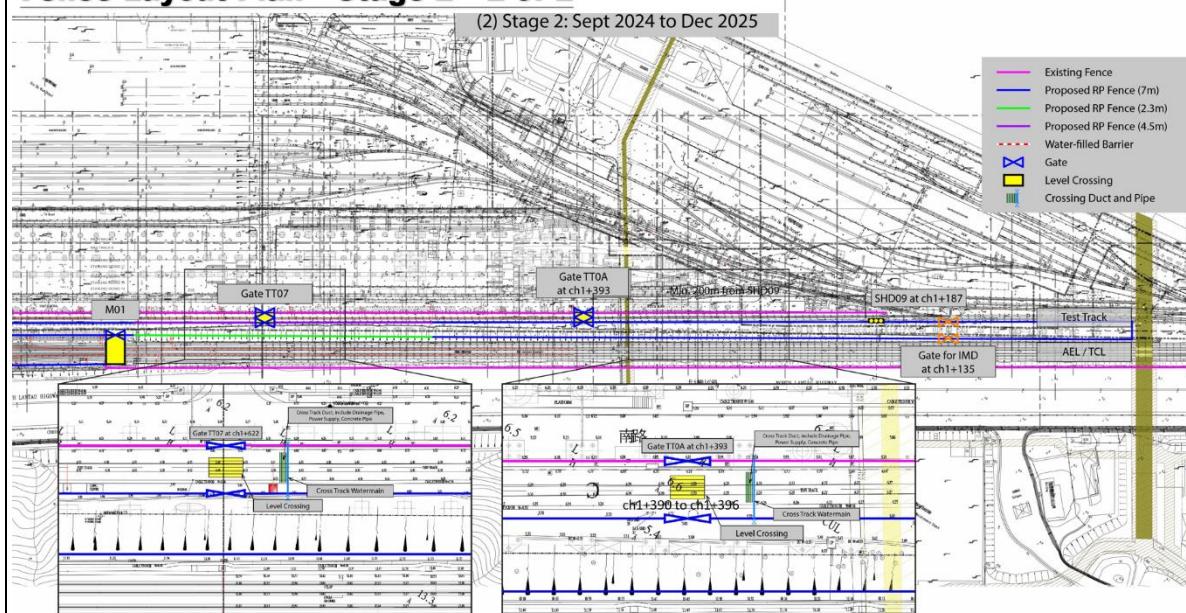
Stage 2 RP Fence Layout Plan
